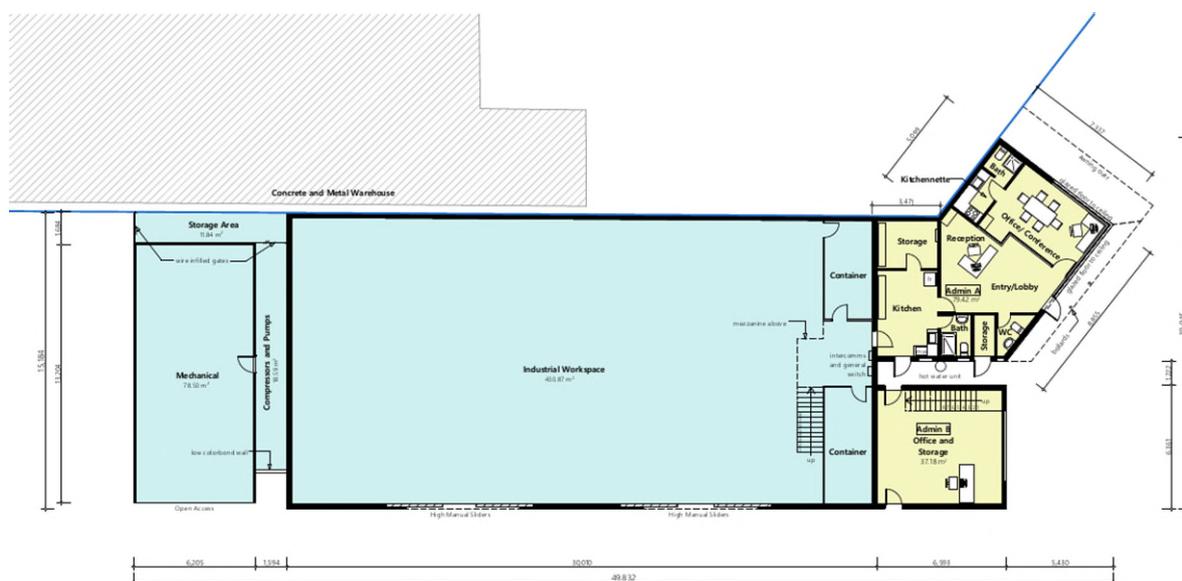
Architectural Plan for 8 Noonan Road, Ingleburn
